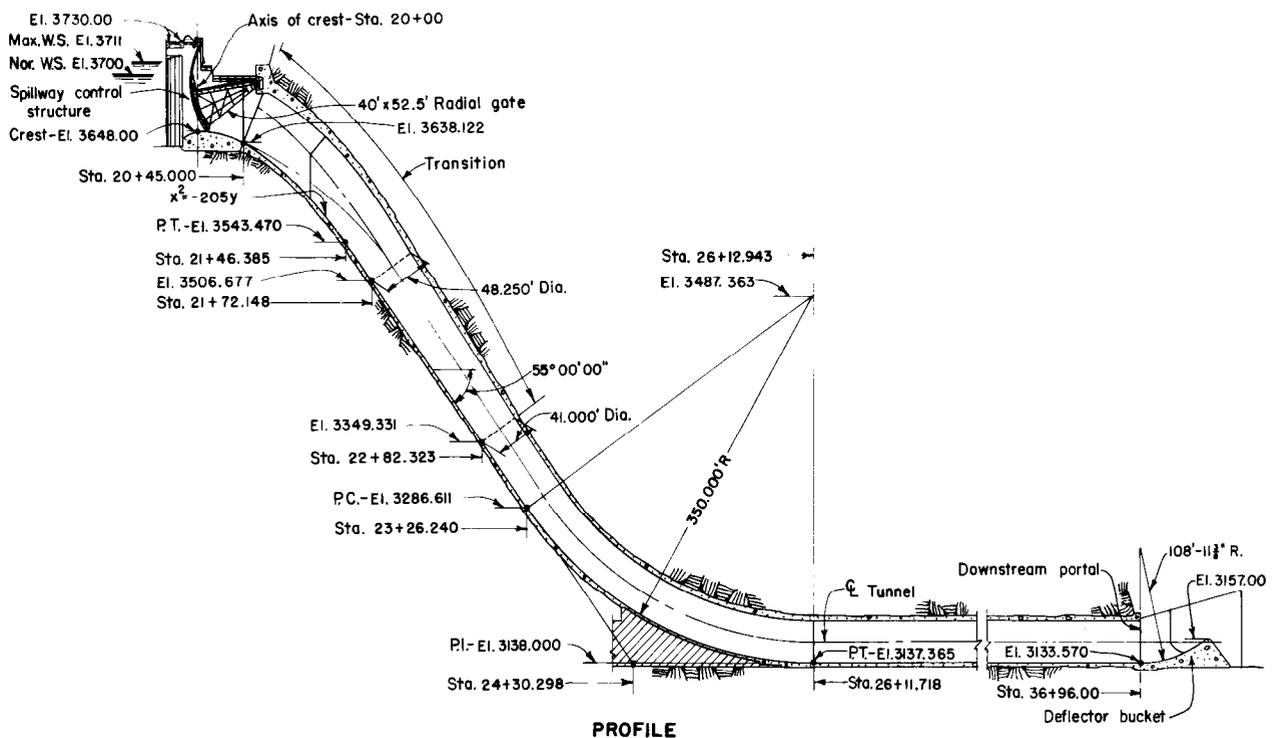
Profile of typical tunnel spillway channel.—288-D-3048
